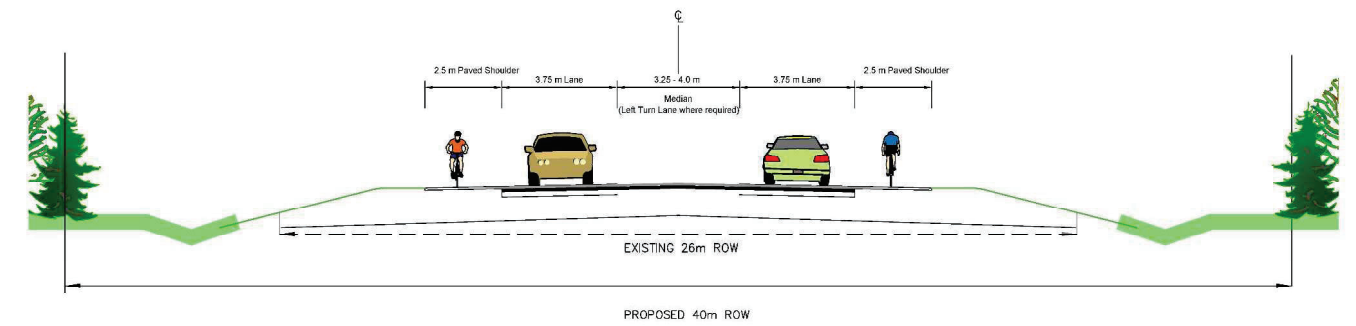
Section 2 Alternative 3 - 3-Lane Rural Cross Section
